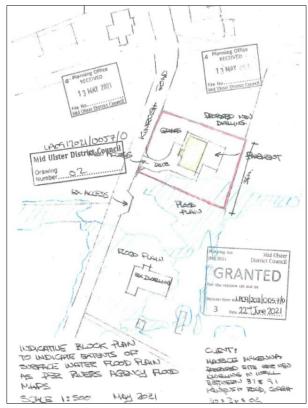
Indicative block plan submitted under LA09/2021/0057/O
